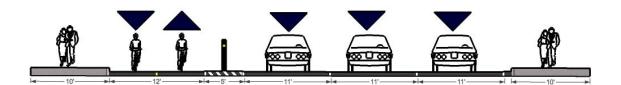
B: Southampton Street Selected Design Cross Section for One-Way
